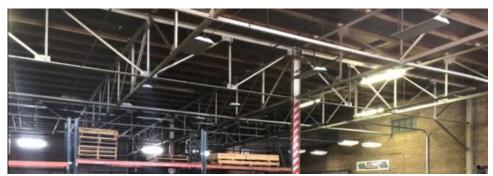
Roof structure in the northern portion of the EDSCO warehouse.
